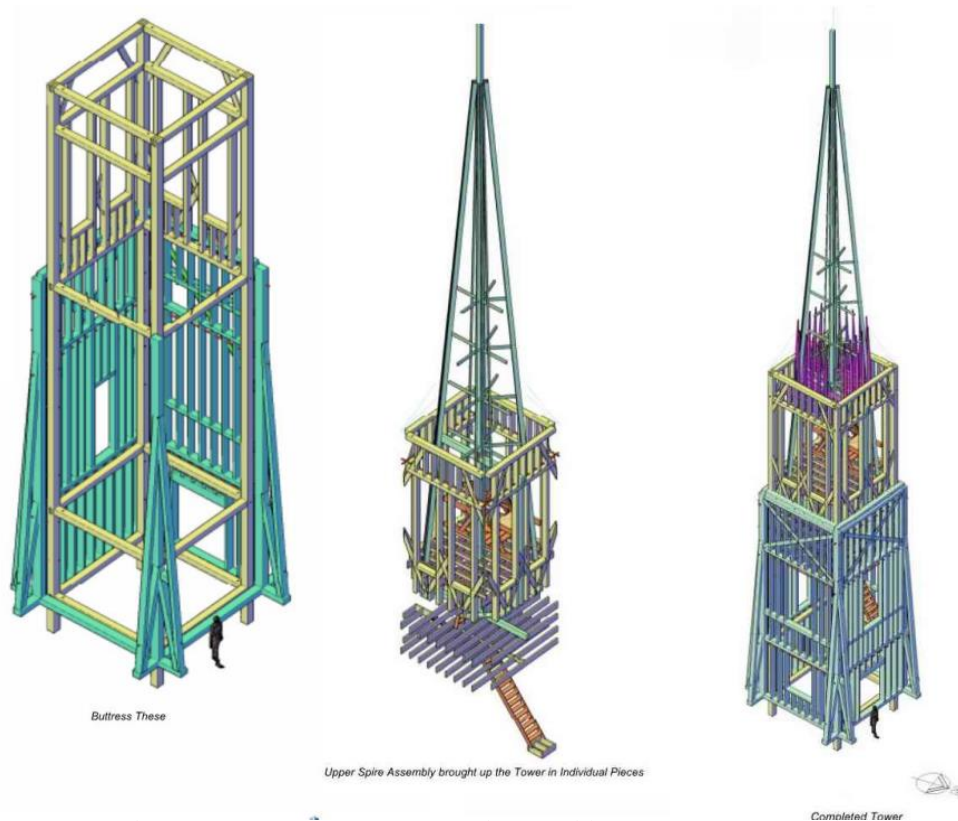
Drafting assumed construction sequence to understand layers of framing in the towers.
